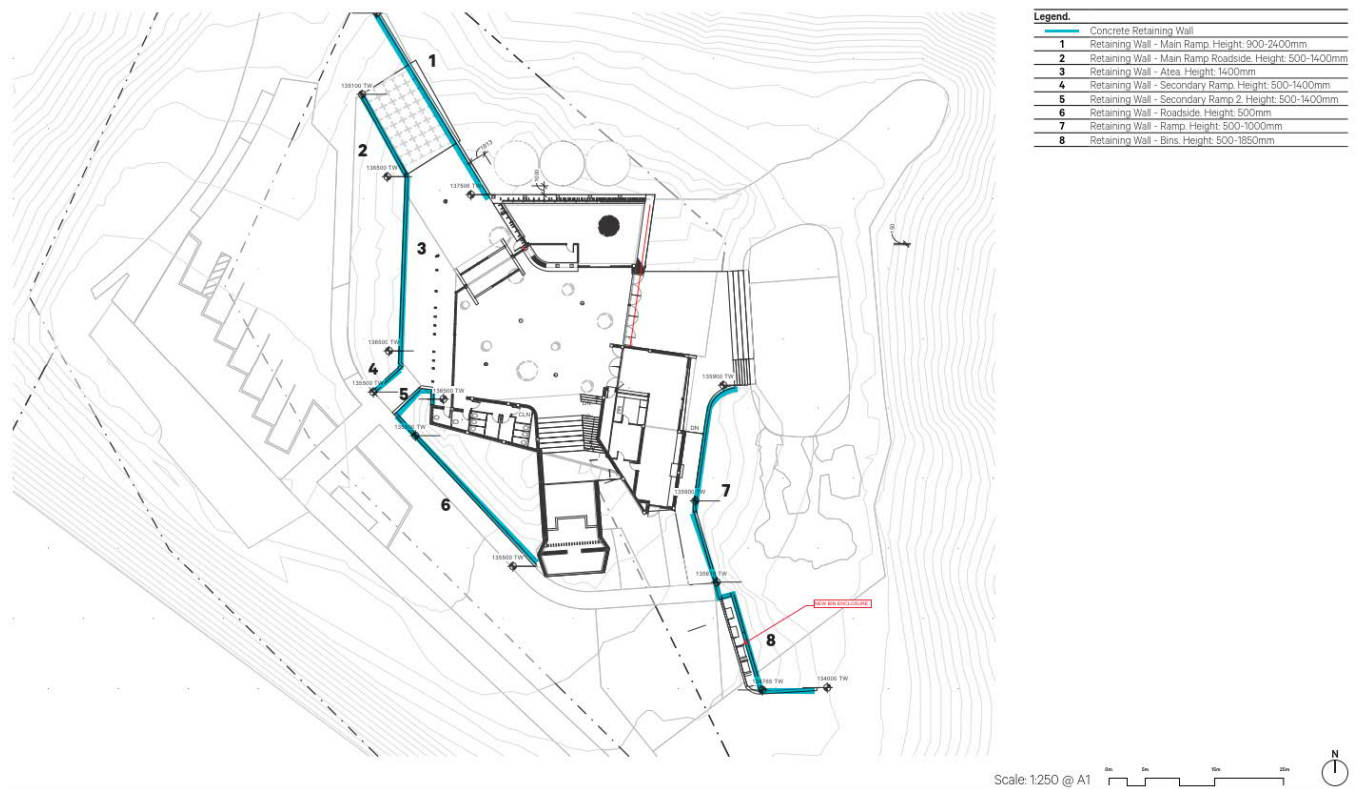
Snip of Retaining Wall plan. Source: Isthmus Architects.
